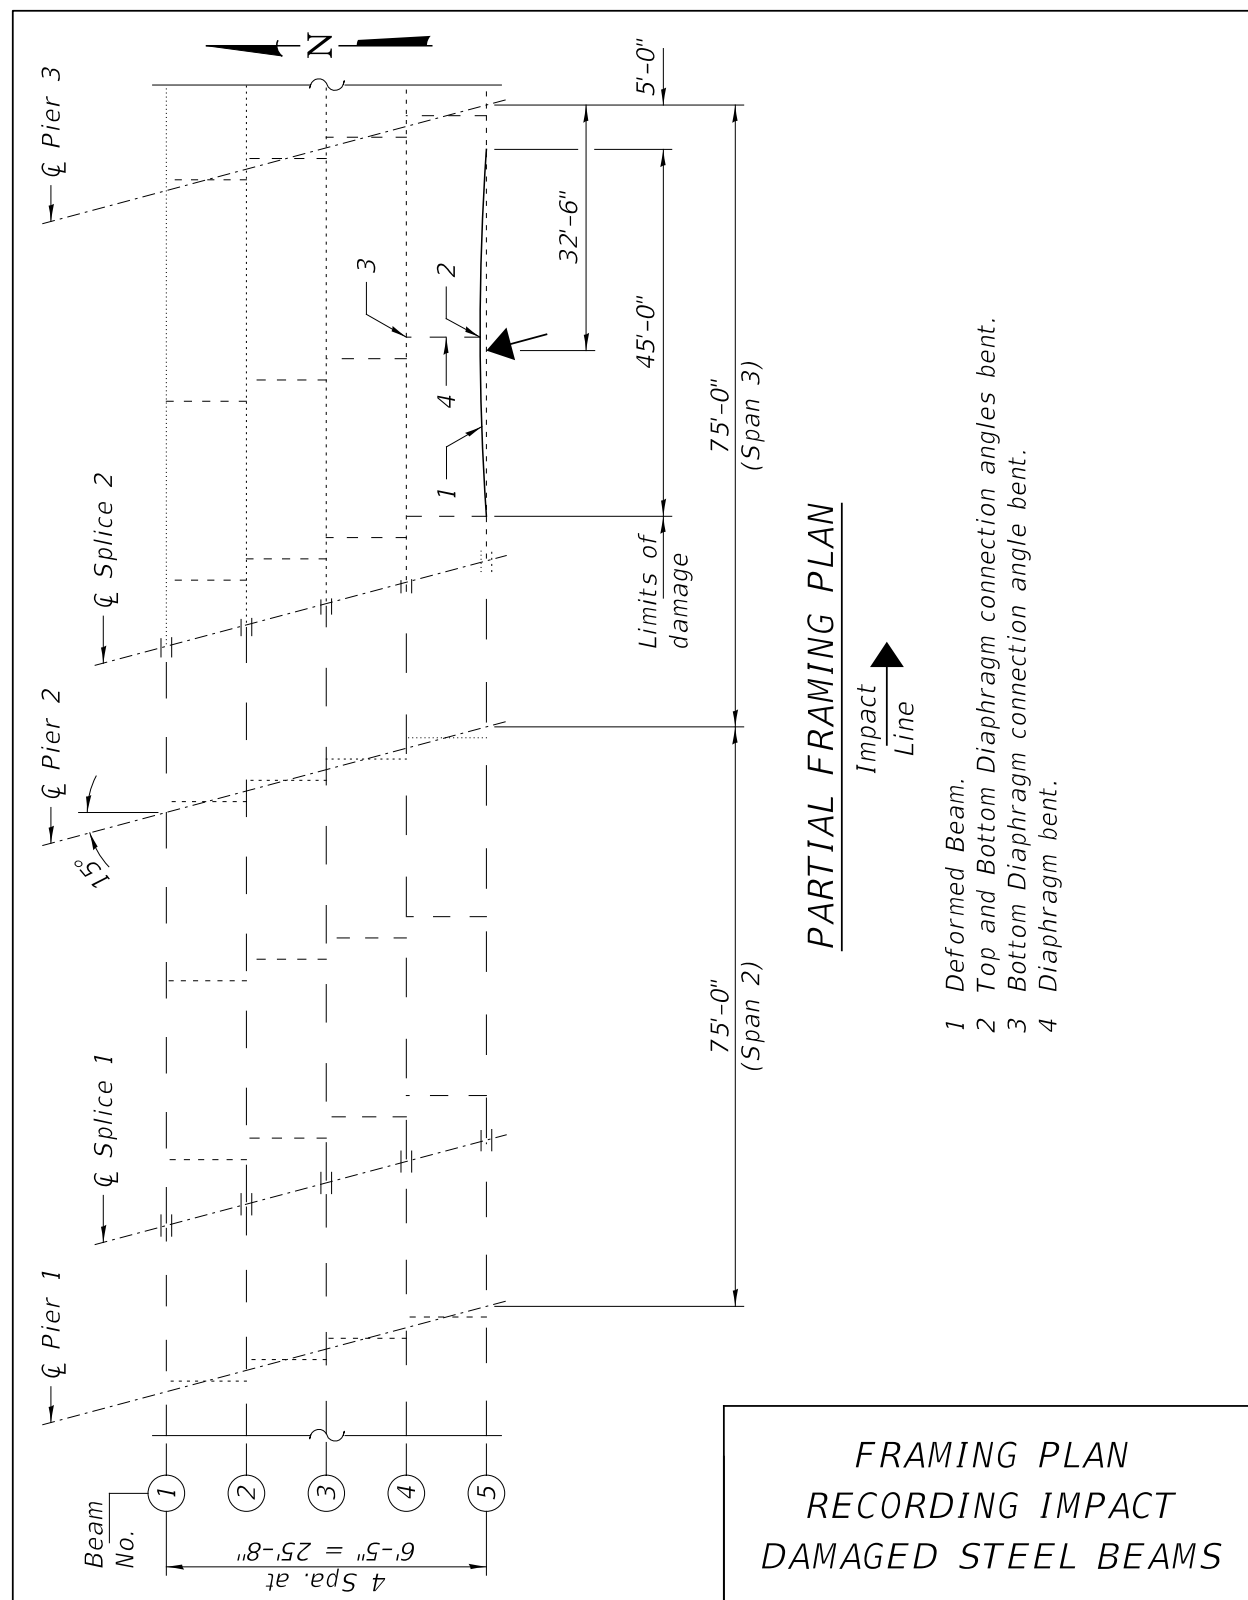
Framing Plan Recording Impact-Damaged Steel Beams
